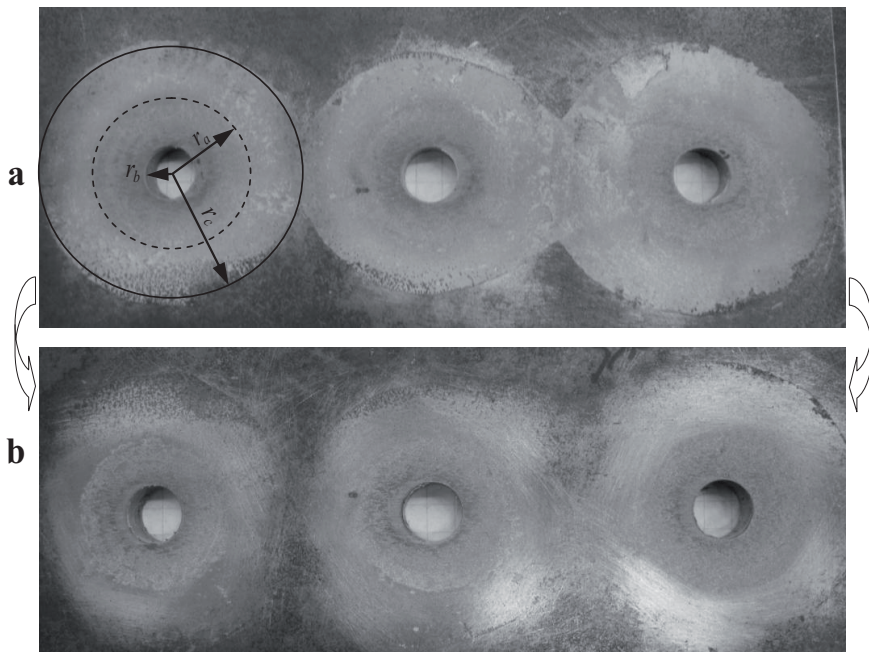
Damaged contact surfaces of the adhesive reinforced multi-fastener lap-connection. Only the case with the clamping load $P_f = 35$ kN is shown here, but the observation for $P_f = 50$ kN was similar. Predominantly cohesive damage can be observed for the grit blasted area determined by $r \in (r_b, r_a)$. In contrast for $r \in (r_a, r_c)$, interfacial damage is predominantly adhesive due to the smoother (ground) surface finish. Moreover, for $r > r_a$, the interface opens due to geometric non-linearity, see from Figure 25. The average outer limit radius of the flow of uncured adhesive was measured, $r_c \approx 36 \pm 8$ mm. The photographs a) and b) correspond to the mating surfaces, which were in the contact during shear testing.
